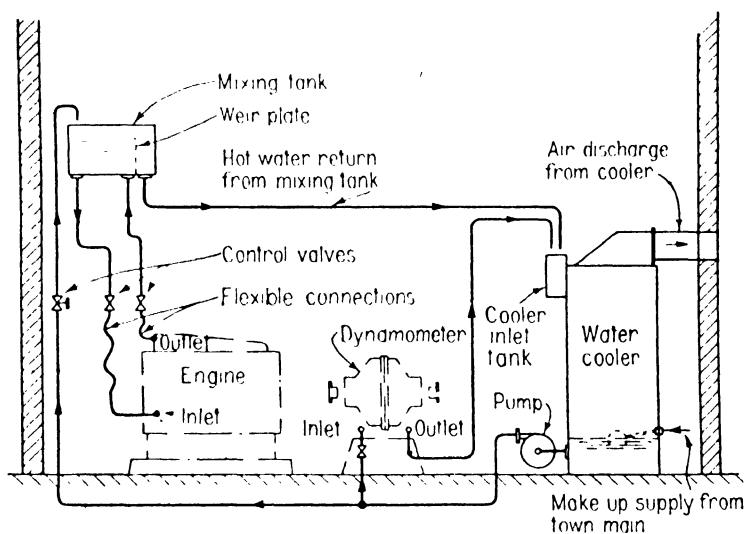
Diagrammatic piping layout for test plant with Heenan water cooler.
